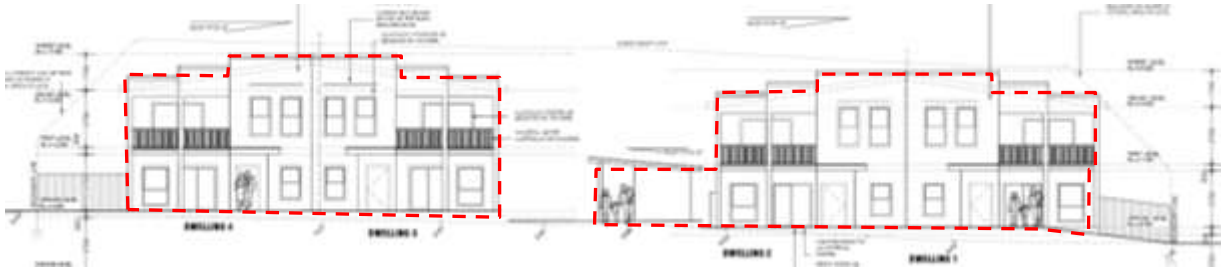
Consented North Elevation with outline of proposed modified elevation indicated in dashed red line
